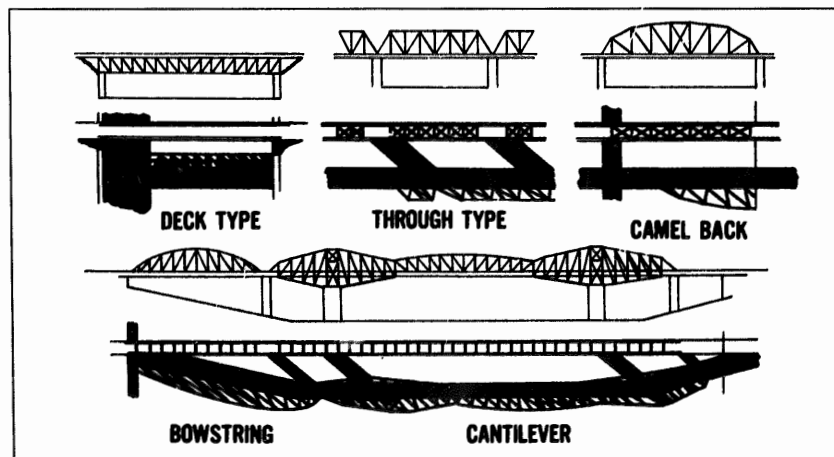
Various truss types and their shadows. Note how the truss under the deck bridge is revealed by its shadow.
